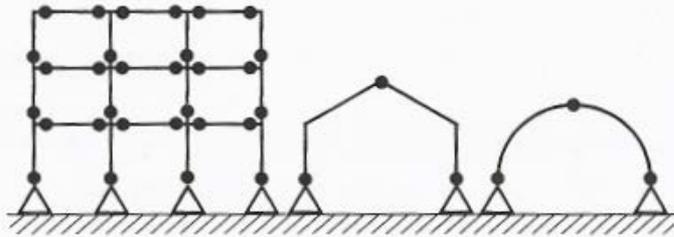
Discontinuous structures. The multi-storey frame has insufficient constraints for stability and would require the addition of a bracing system. The three-hinge portal frame and three-hinge arch are self-bracing, statically determinate structures.
